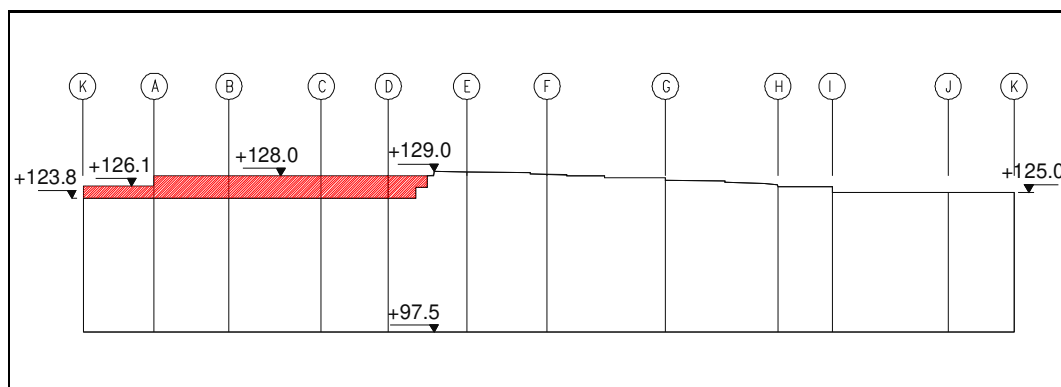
Completed retaining wall constructions (red hatched area) on the 12th day of April.
